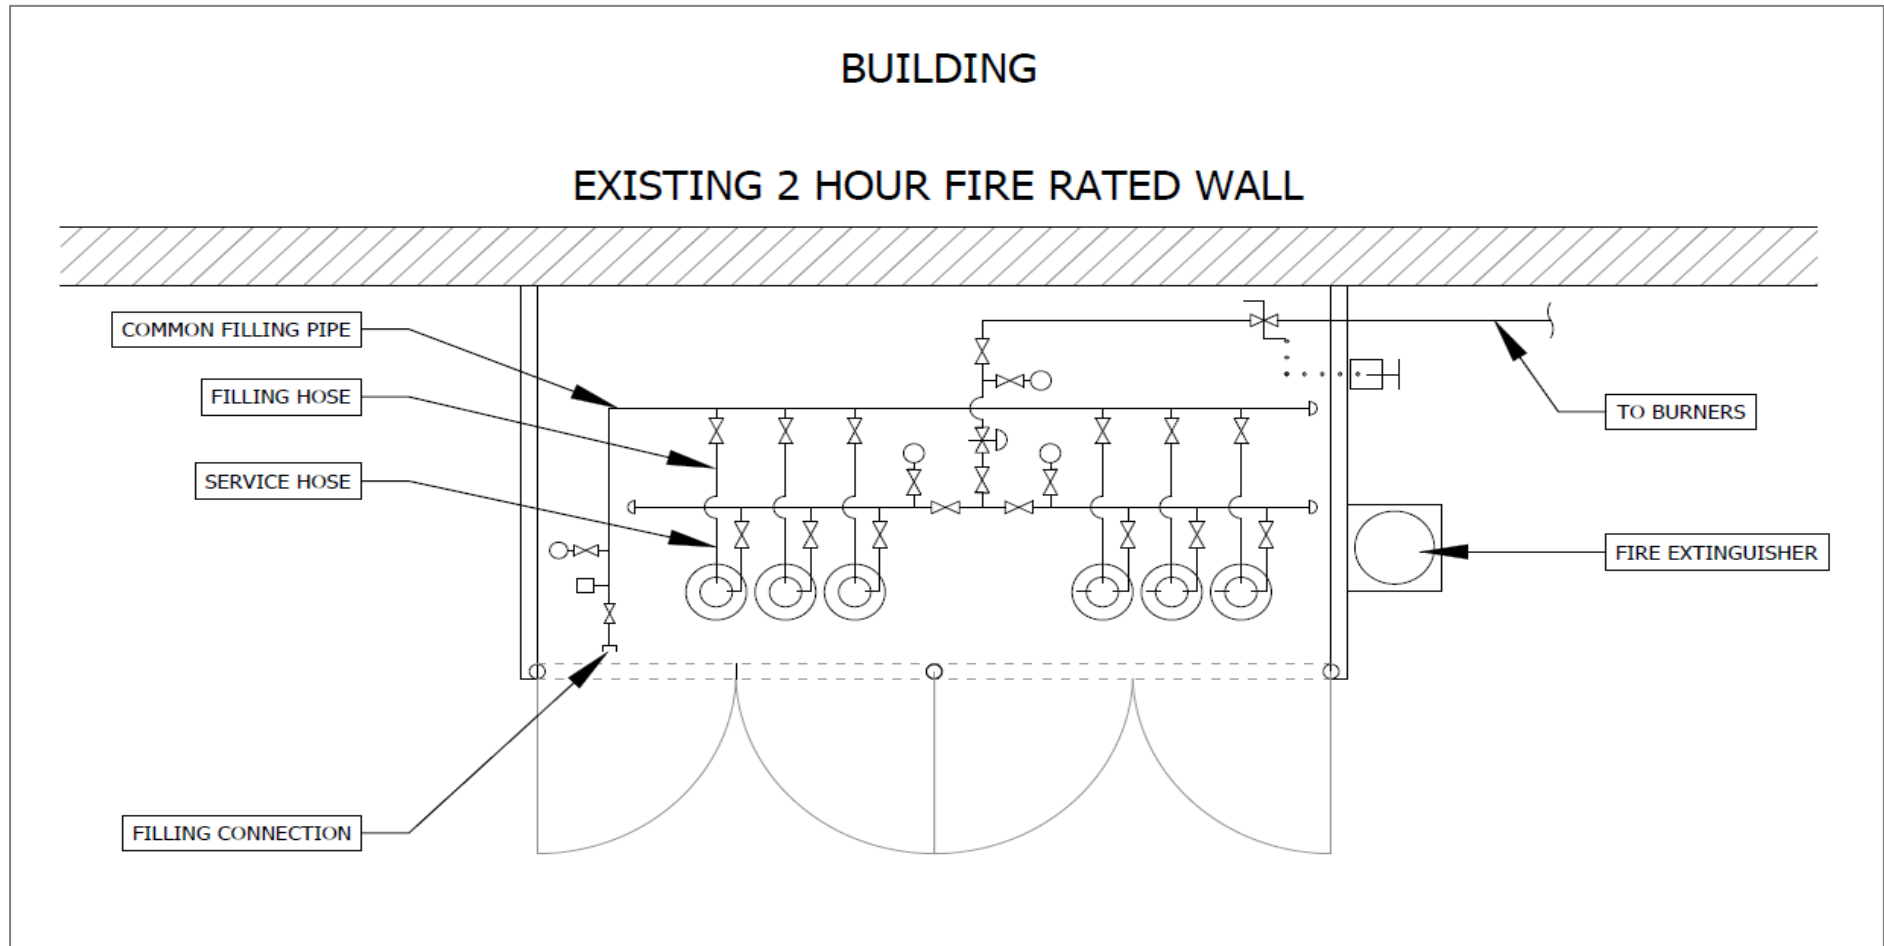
Diagram illustrates in-situ refillable LPG cylinders connected to common filling pipe (top view)
